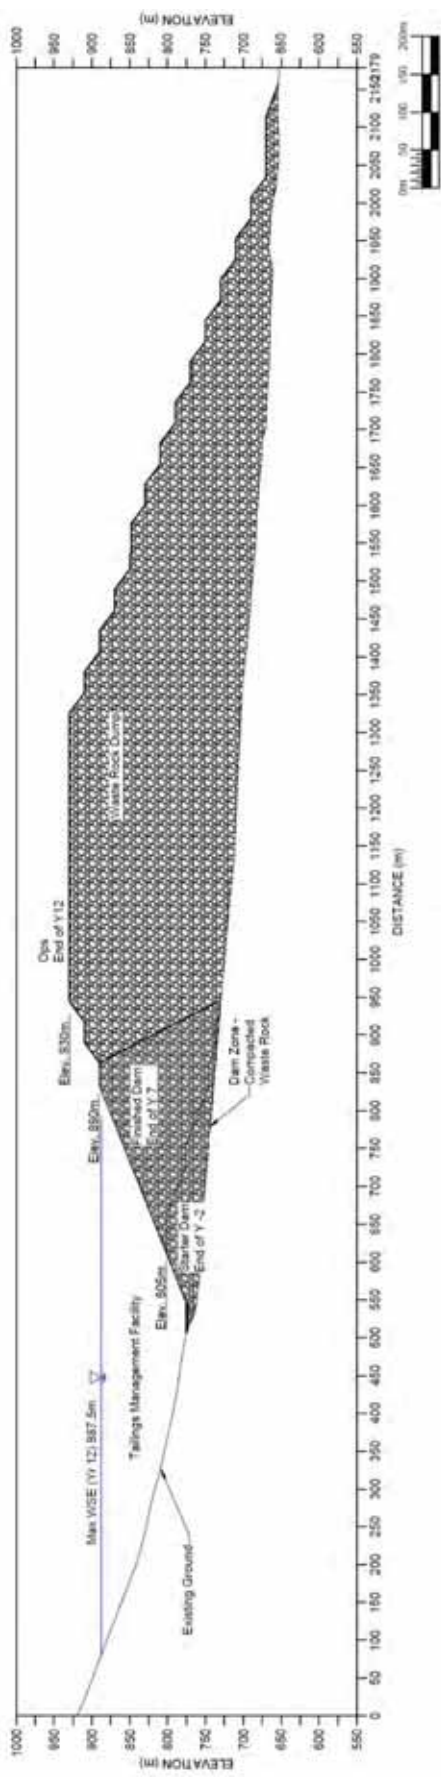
Cross Section through the TMF & WRF showing Starter Dam to Elevation 805 m (SRK, 2020)
